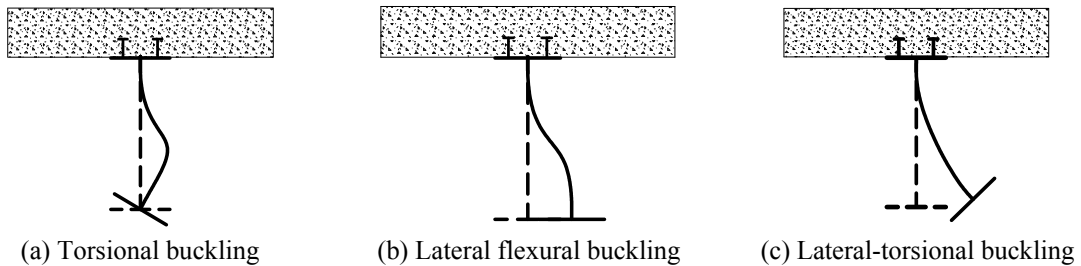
Distortional buckling modes of I-steel concrete composite beams under negative moment
